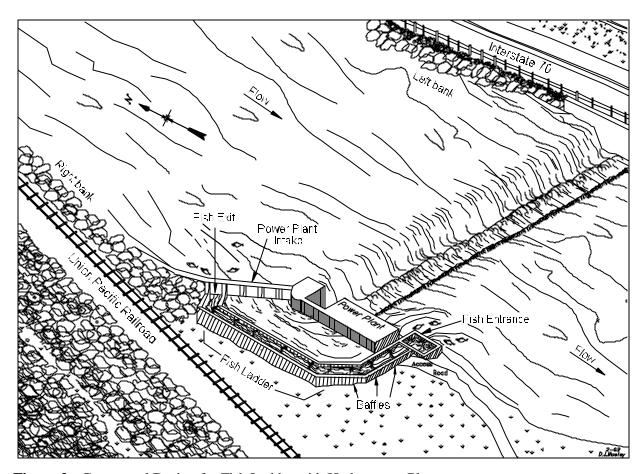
Conceptual Design for Fish Ladder with Hydropower Plant
